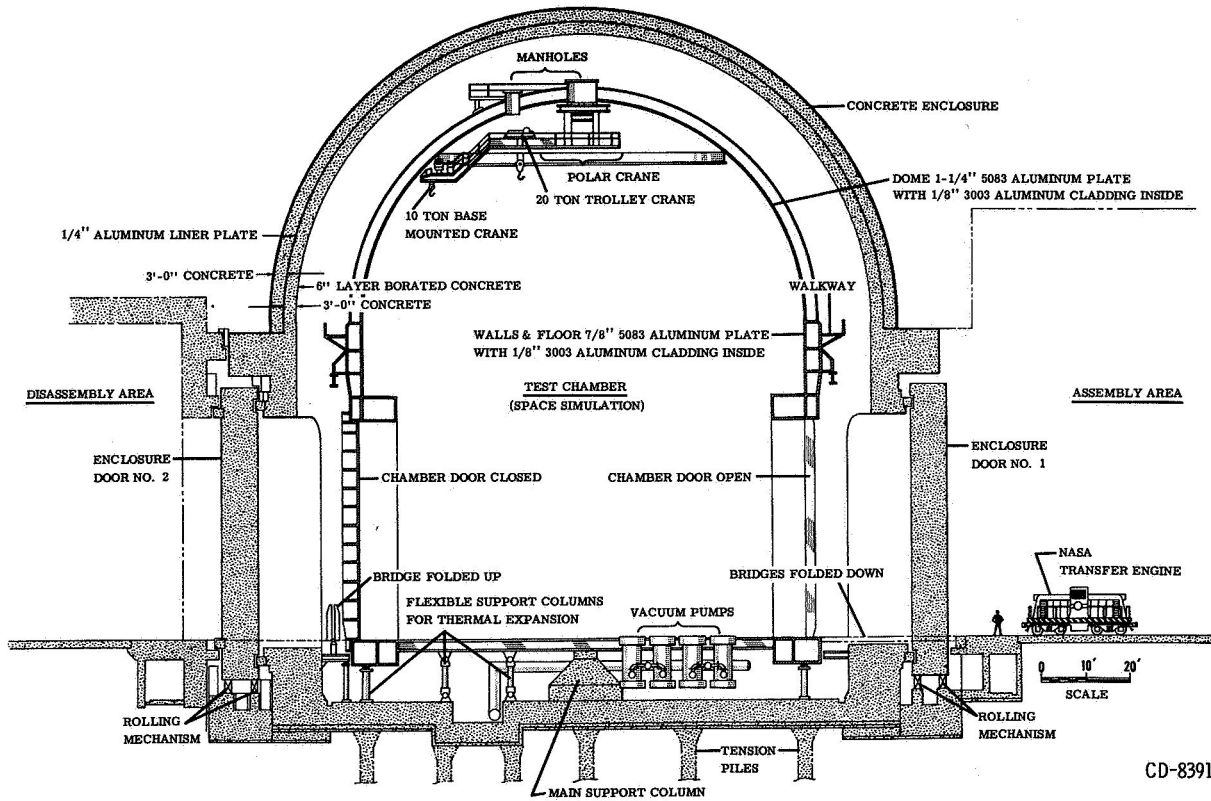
Cross section of Space Propulsion Facility test chamber.
